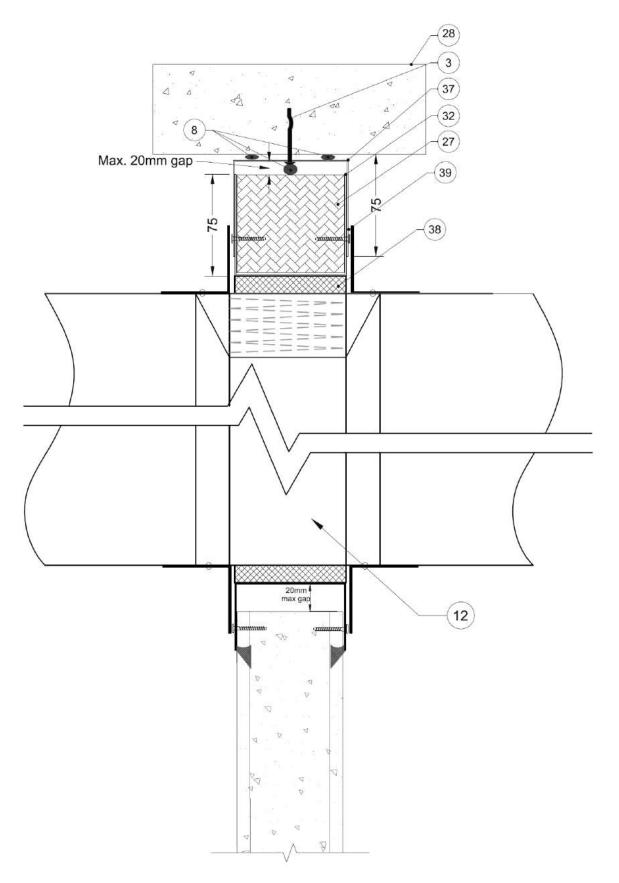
Holyoake IBD-FS and IBD Damper installation 75mm-95mm from top or side
